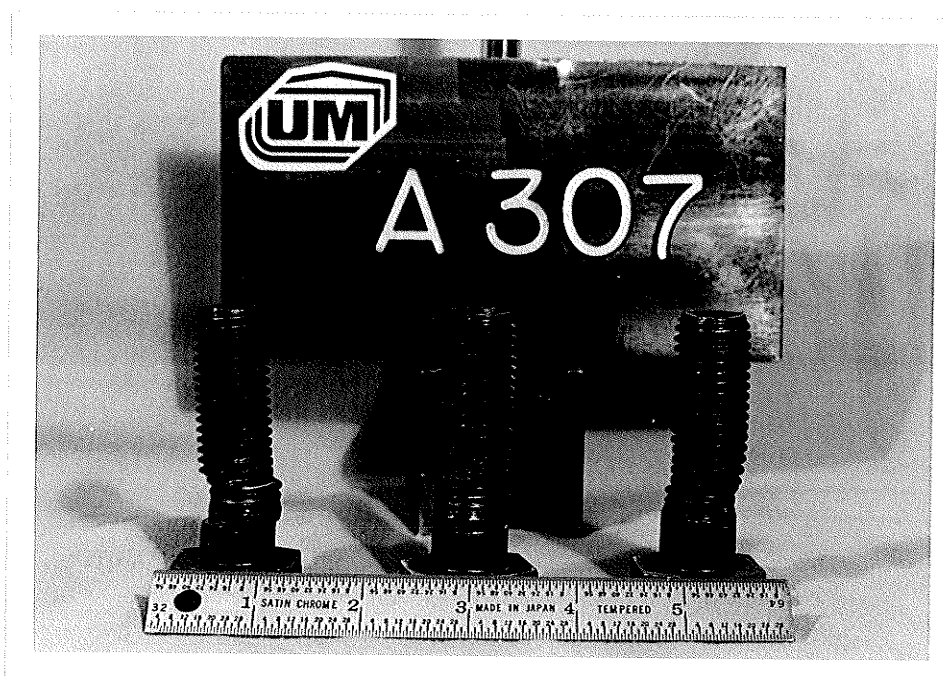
Deformed A307 Bolts at the End of Tests.
